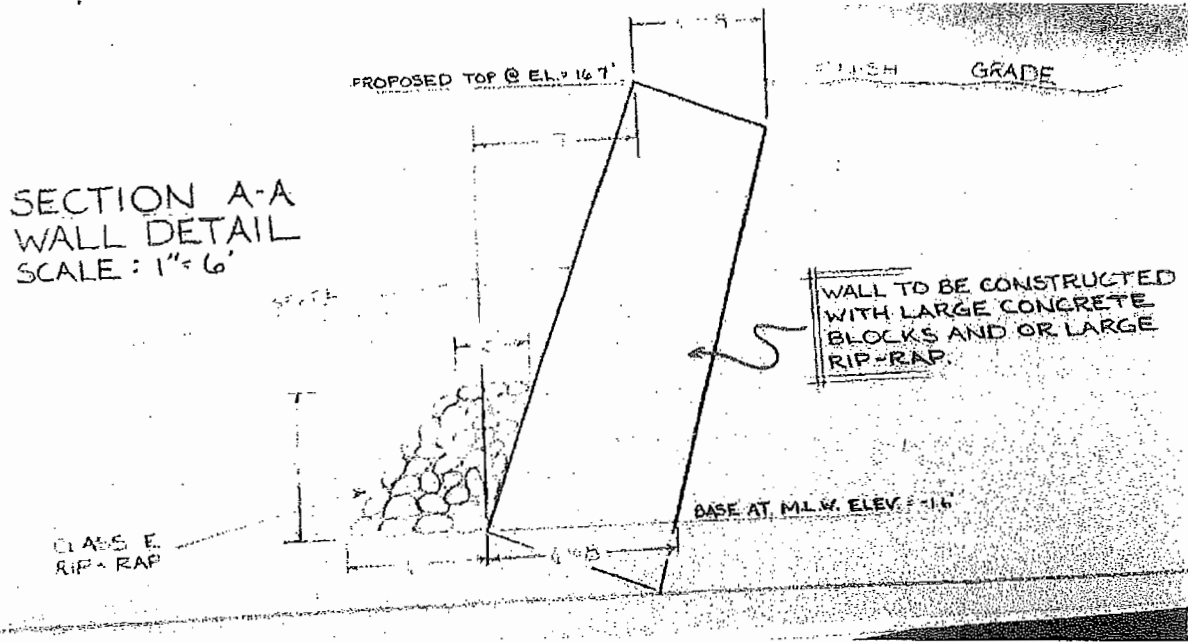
Approved Cross-Section from file 1983-11-014 – note overall dimensions and proposed MLW
